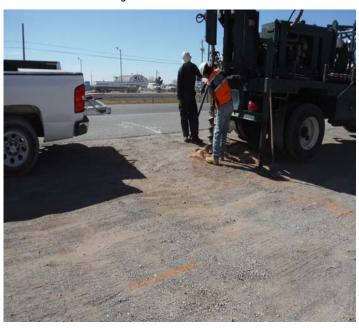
View of the drilling activity at soil boring location B-31 and existing site conditions.
